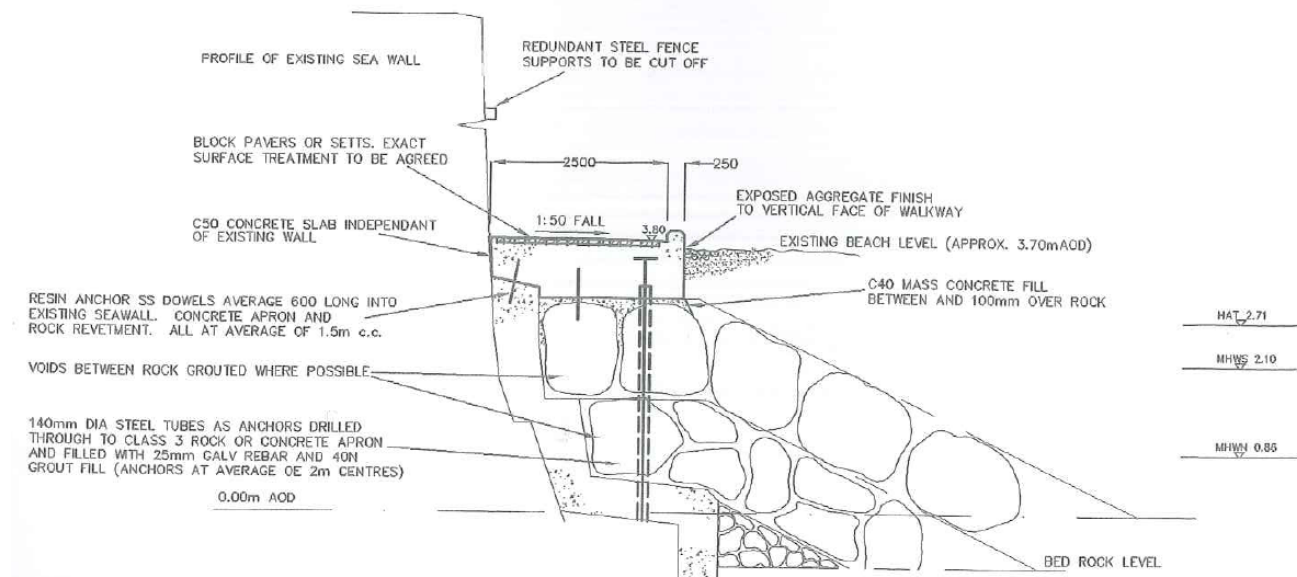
Drawing showing the construction details for Clifton Walkway 1999 (from Russell Corney, 2014)
